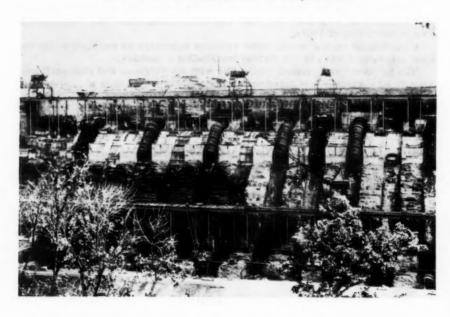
GENERAL VIEW OF CONSTRUCTION AT ROBERT MOSES GENERATING PLANT
